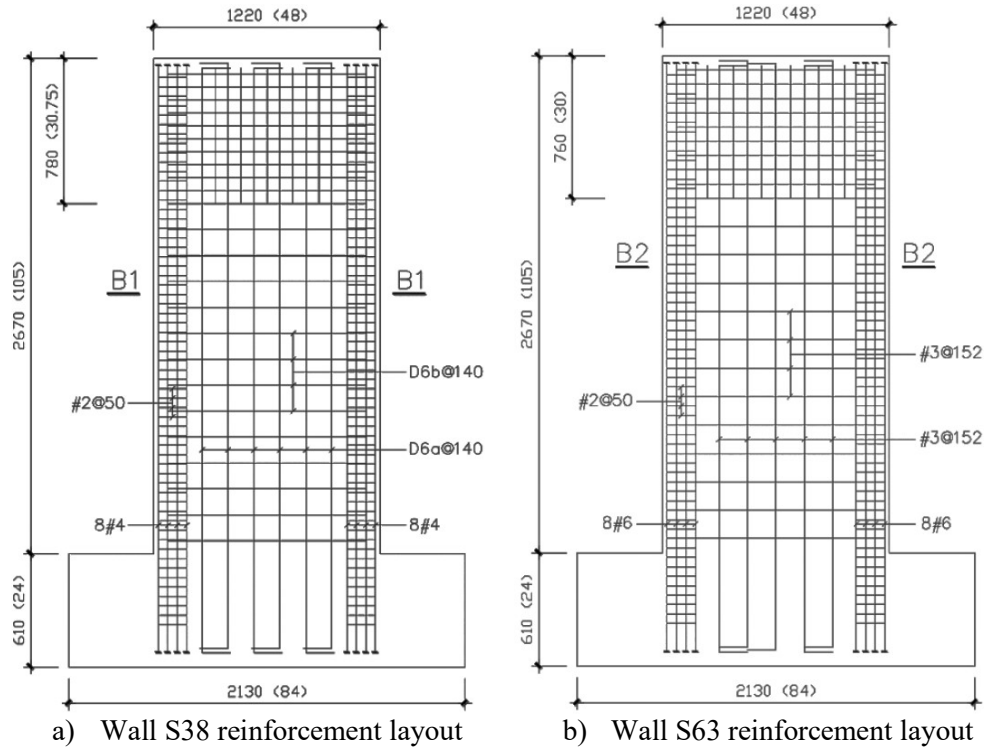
Details of walls tested by Tran & Wallace (2012)
